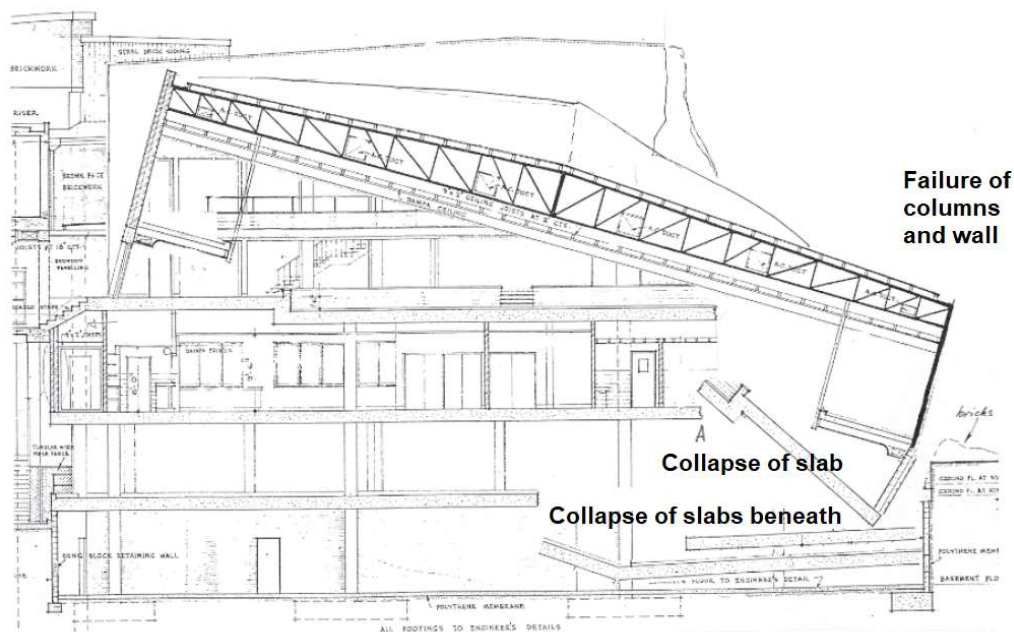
Reconstruction of the cross-section through the Newcastle Workers Club showing collapsed wall, rotation of the steel structure of the roof and collapse of concrete slabs beneath. Modified from Melchers (2010).
